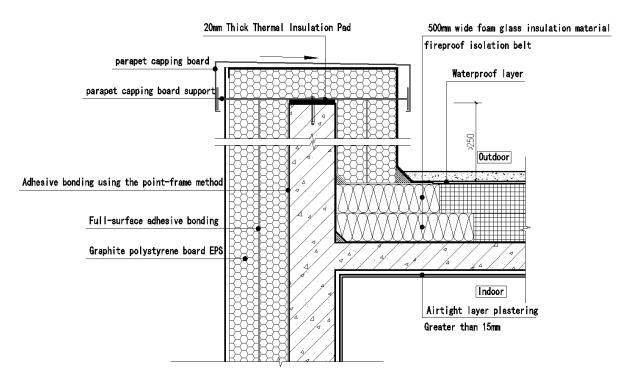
Insulation and Waterproof Construction Practice of Flat Roof Daughter Wall
